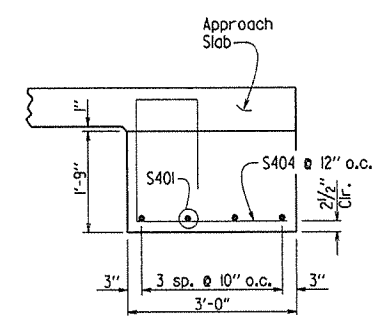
DETAILS OF LONGITUDINAL CONSTRUCTION JOINT
